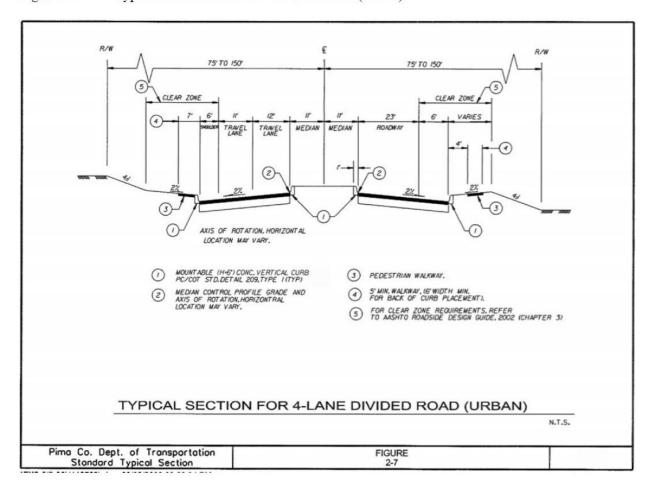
Typical Section for 4 Lane Divided Road (Urban)
